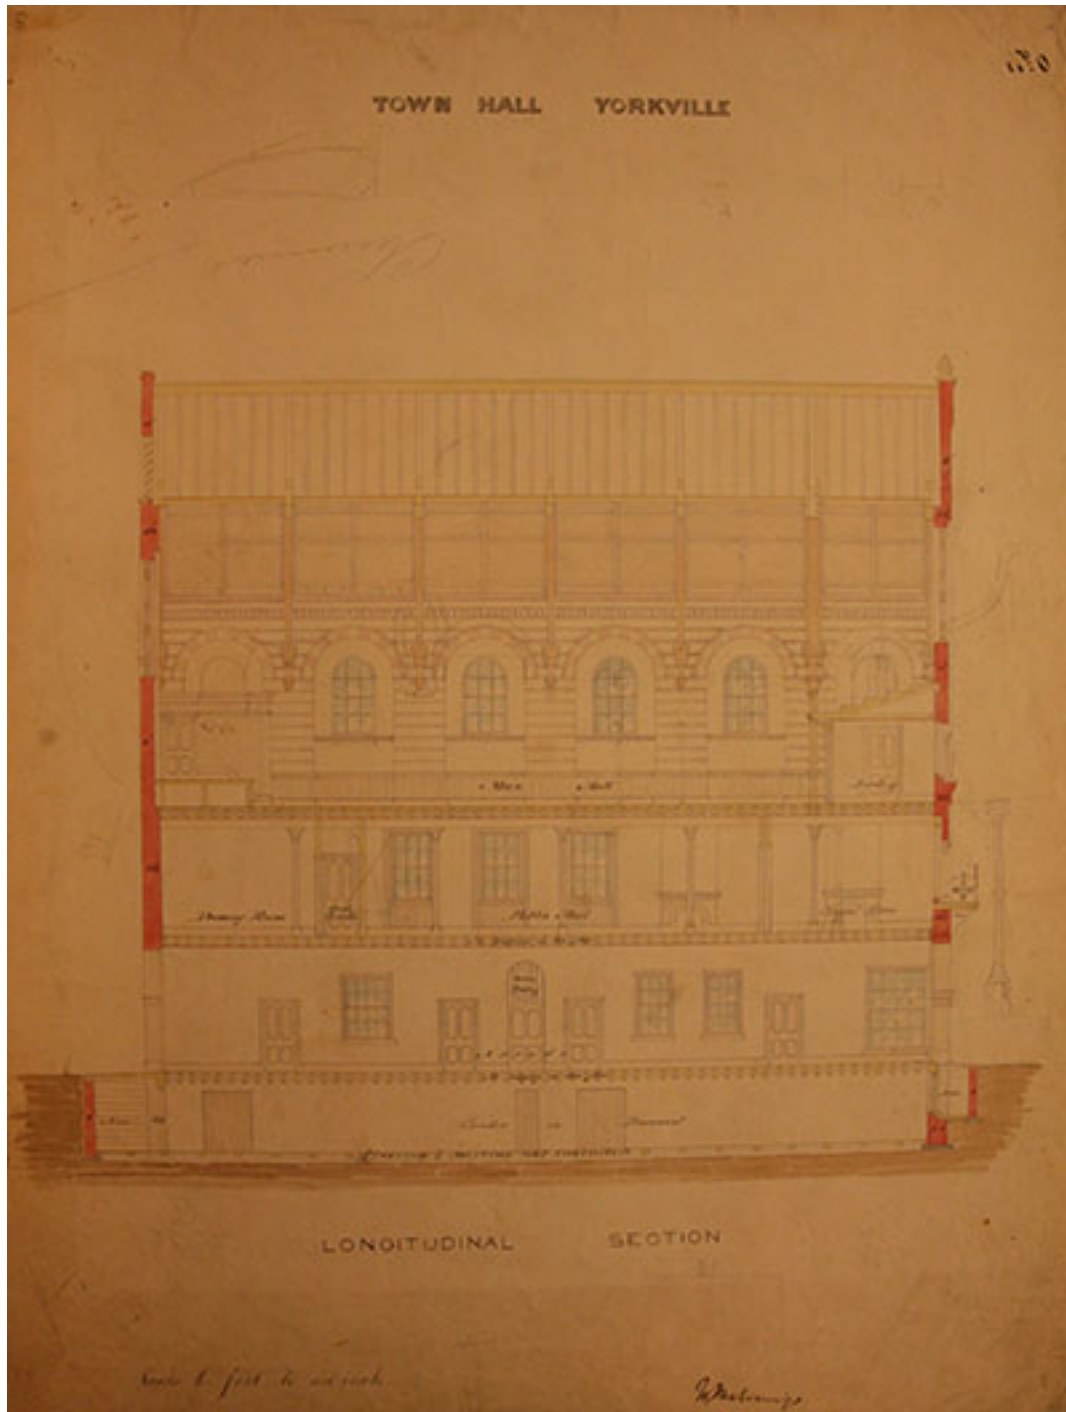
Town Hall, Yorkville, Ontario, drawing of longitudinal section.
